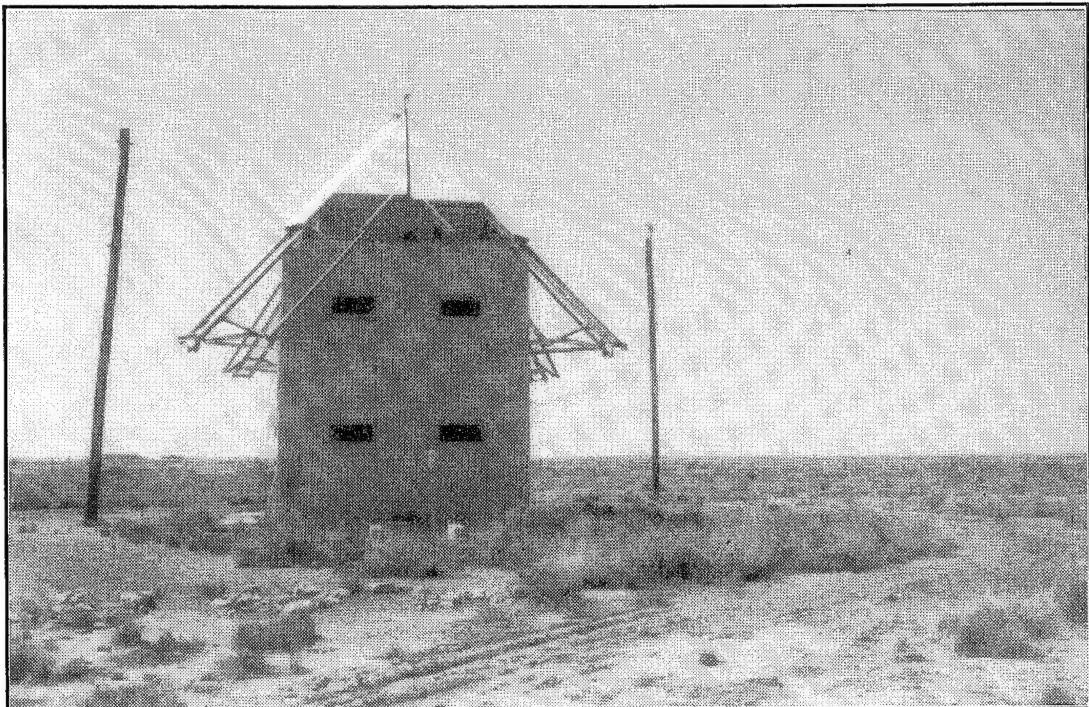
Mart site Missile Theodolite tower, north elevation, with rock-aligned facility name, footings for propane tank, and counterweight (Allred/Space Center 1994).
